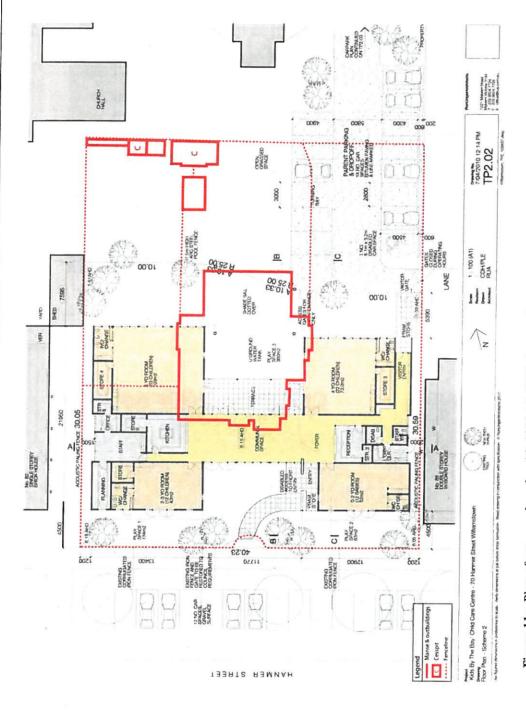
Plan of proposed works with 1908 MMBW plan overlay (adapted from Ron Unger Architects 2010).
